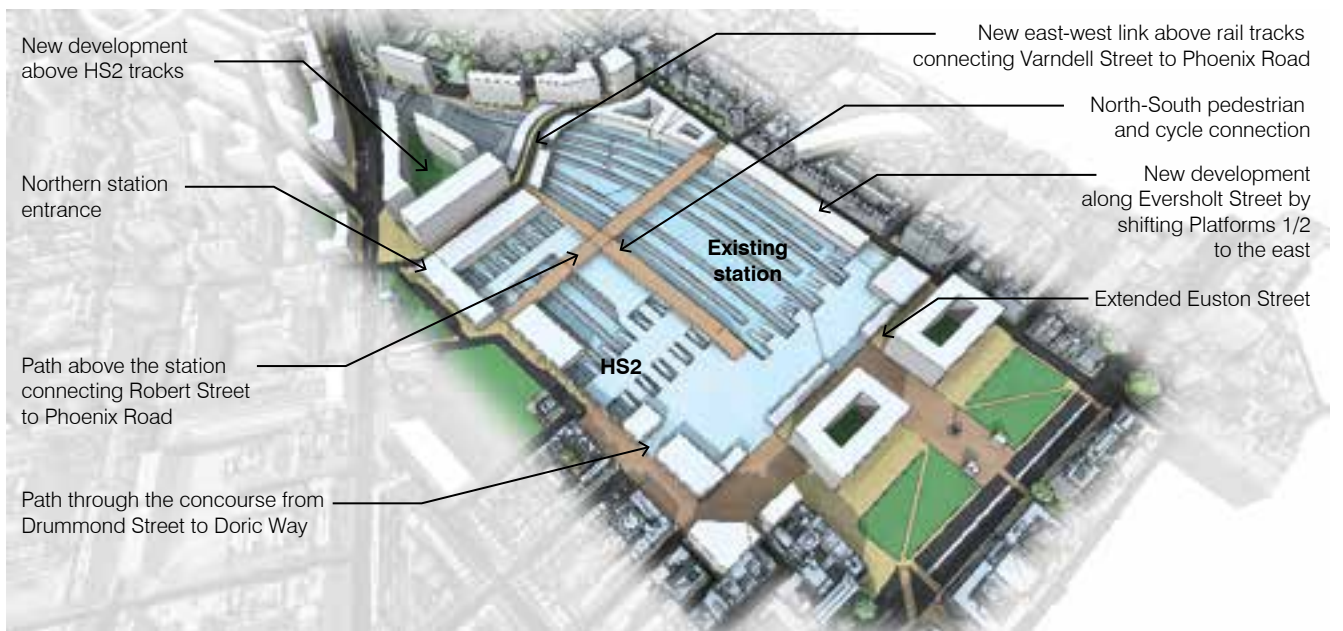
Illustrative 3D model of the proposed station showing internal station layout
